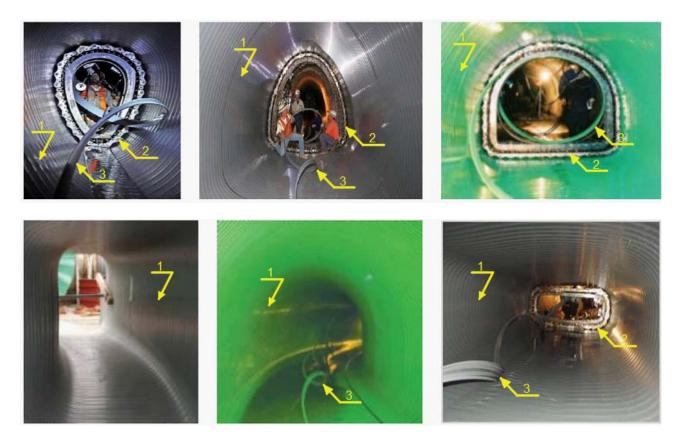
SPR SL technology design form factors: 1 — body of the pipe (collector) after the application of the winding technology; 2 — winding machine; 3 — typical element of SPR SL technology
